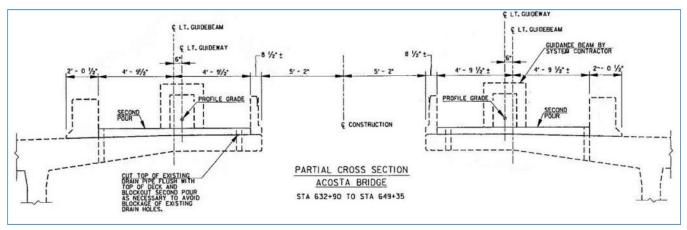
Excerpt from the River Crossing As Built Plans (1994)
